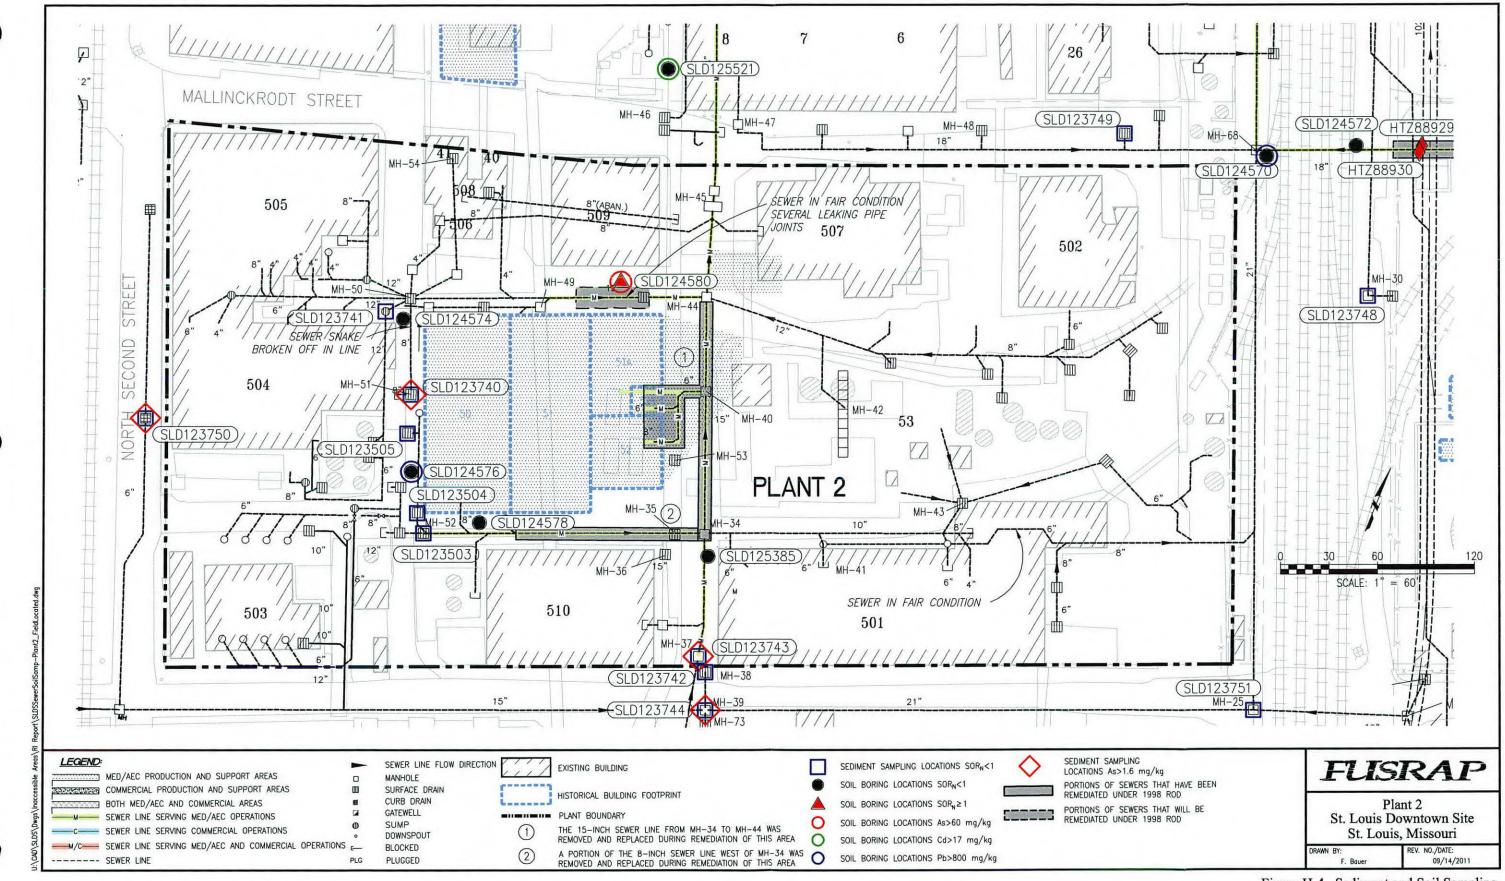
Sediment and Soil Sampling Locations for Sewers at Plant 2
